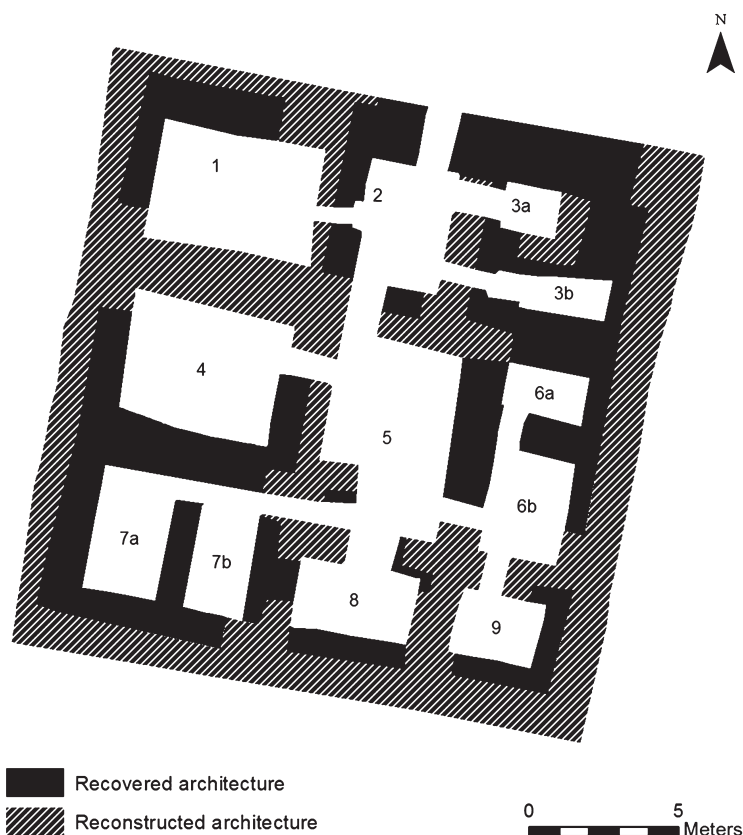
Plan of the level 7 tower at Tell Sabi Abyad. Plan produced by Tijm Lanjouw.
